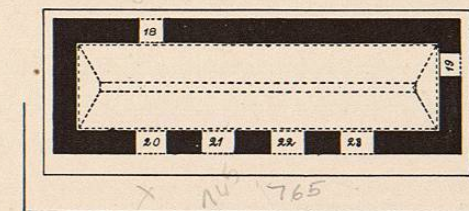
STRUCTURE 22: GROUND-PLAN.
